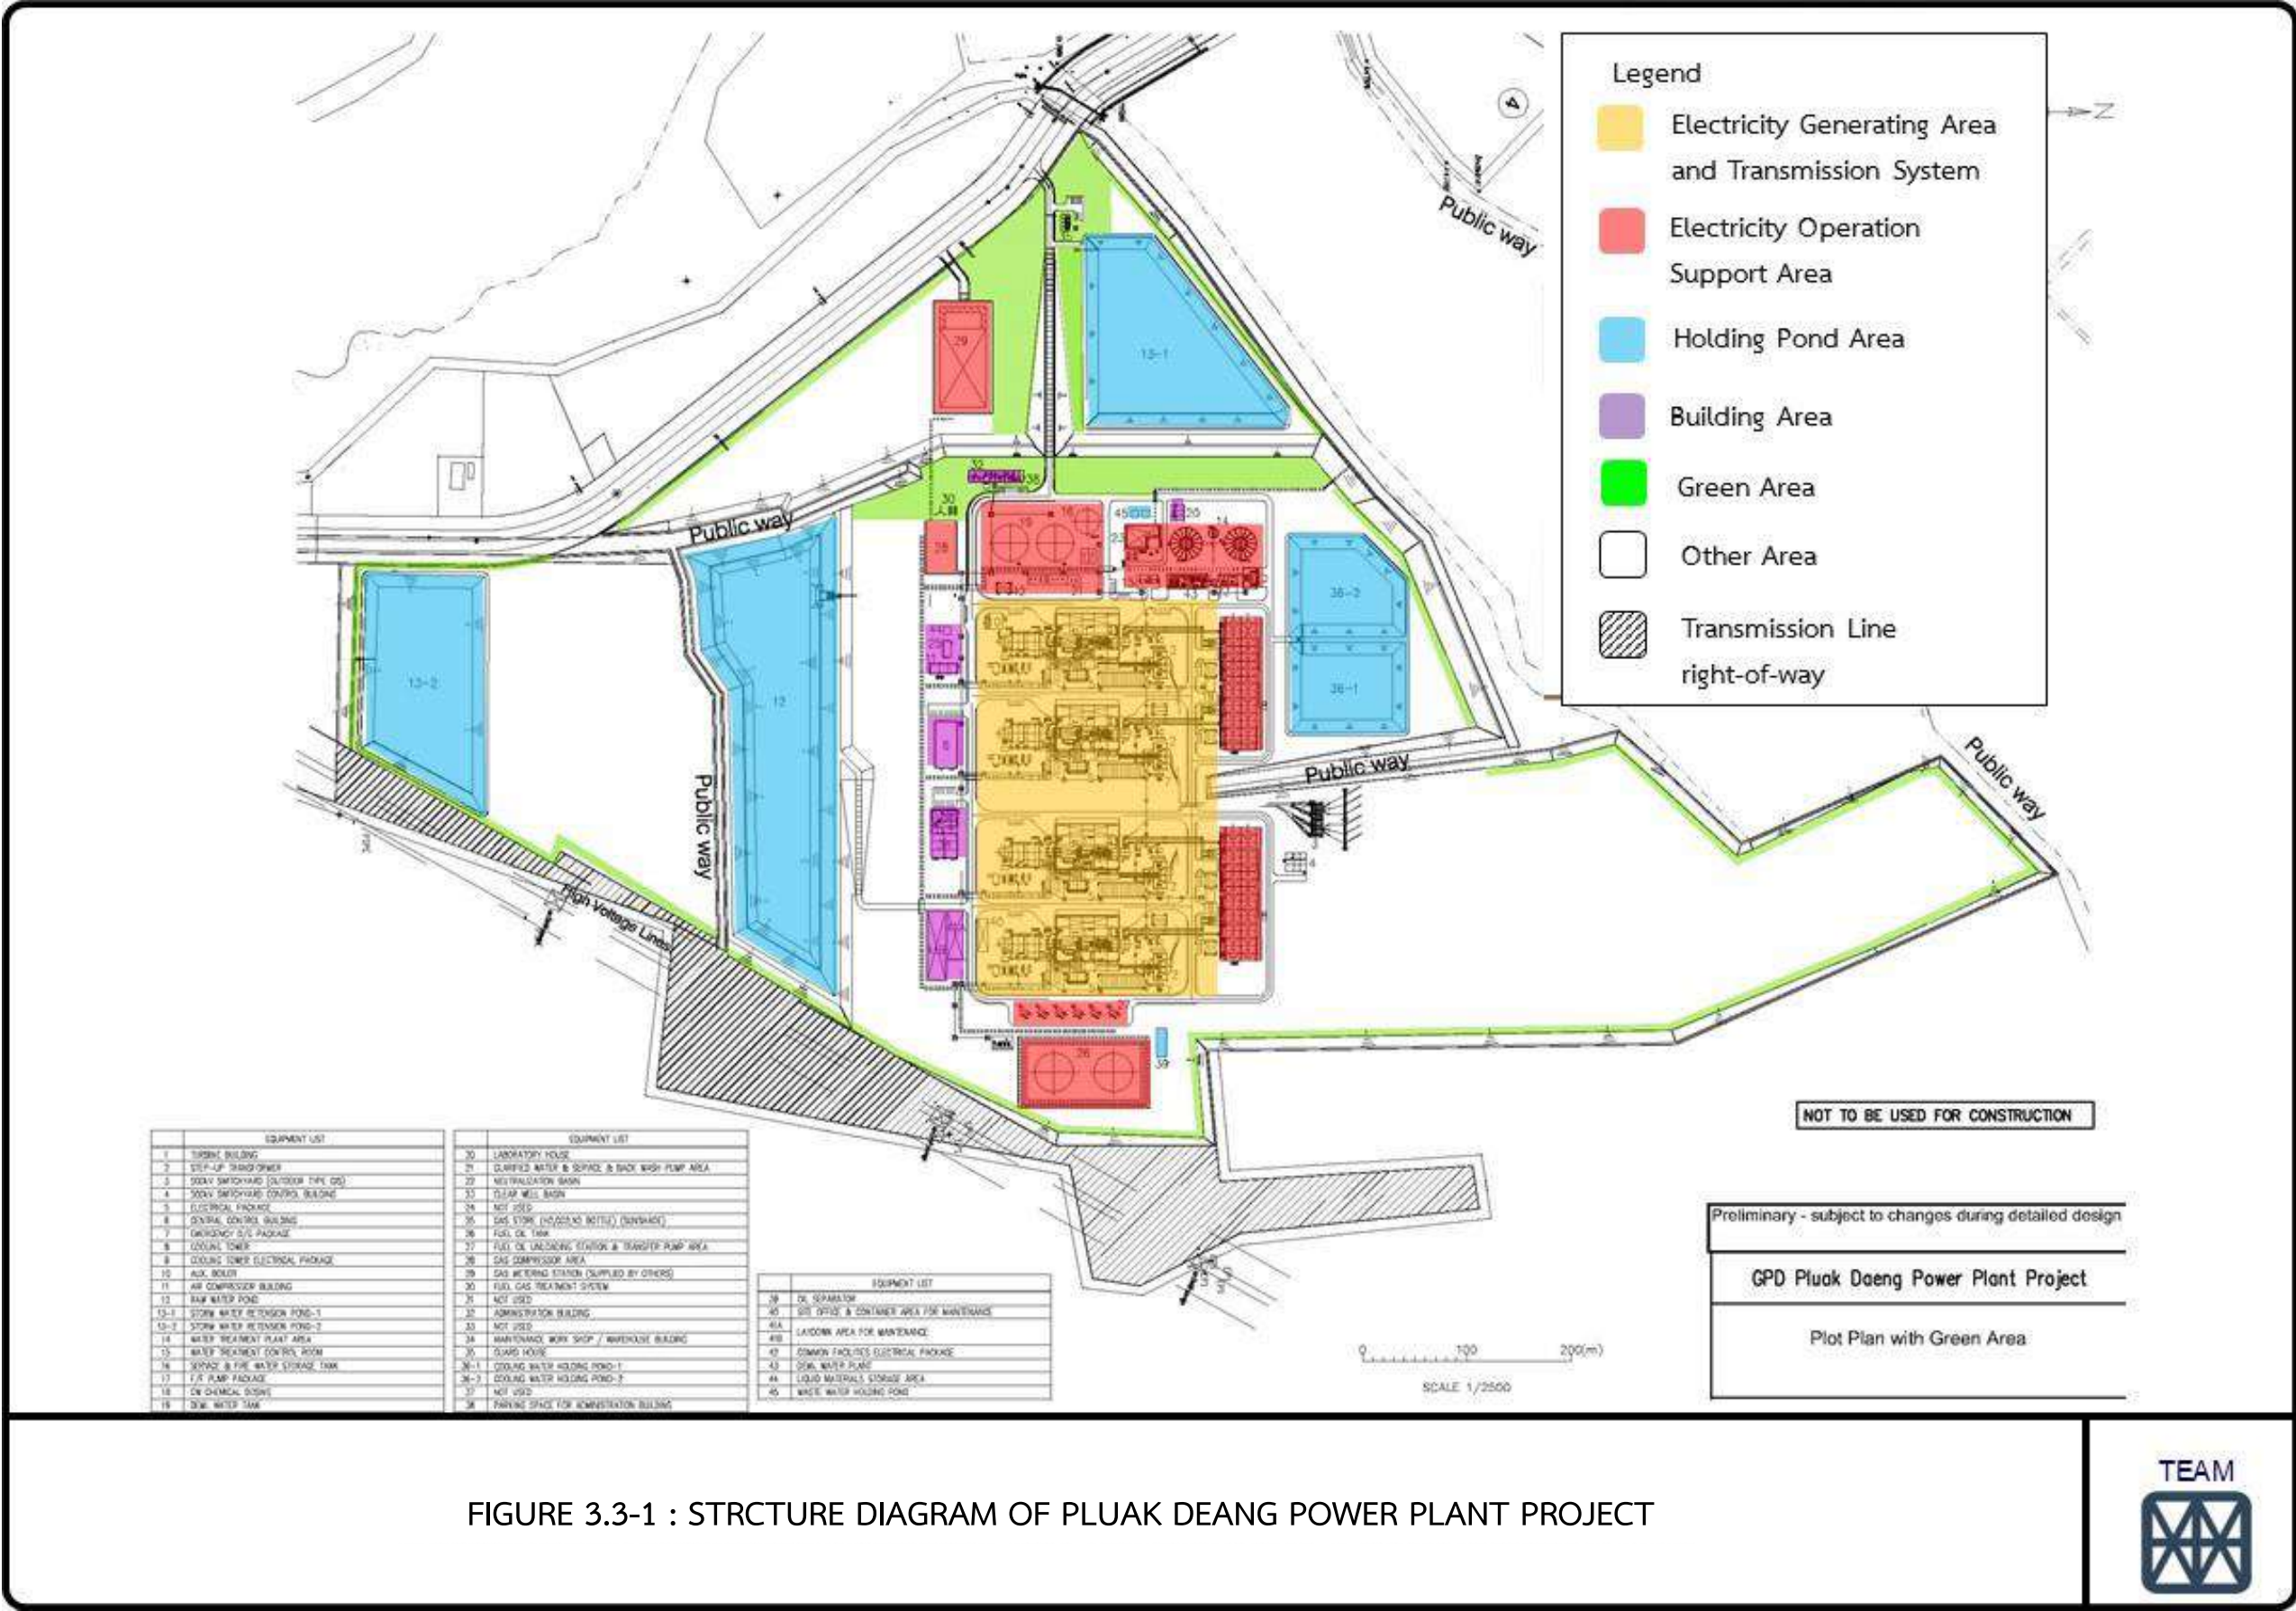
STRCTURE DIAGRAM OF PLUAK DEANG POWER PLANT PROJECT
